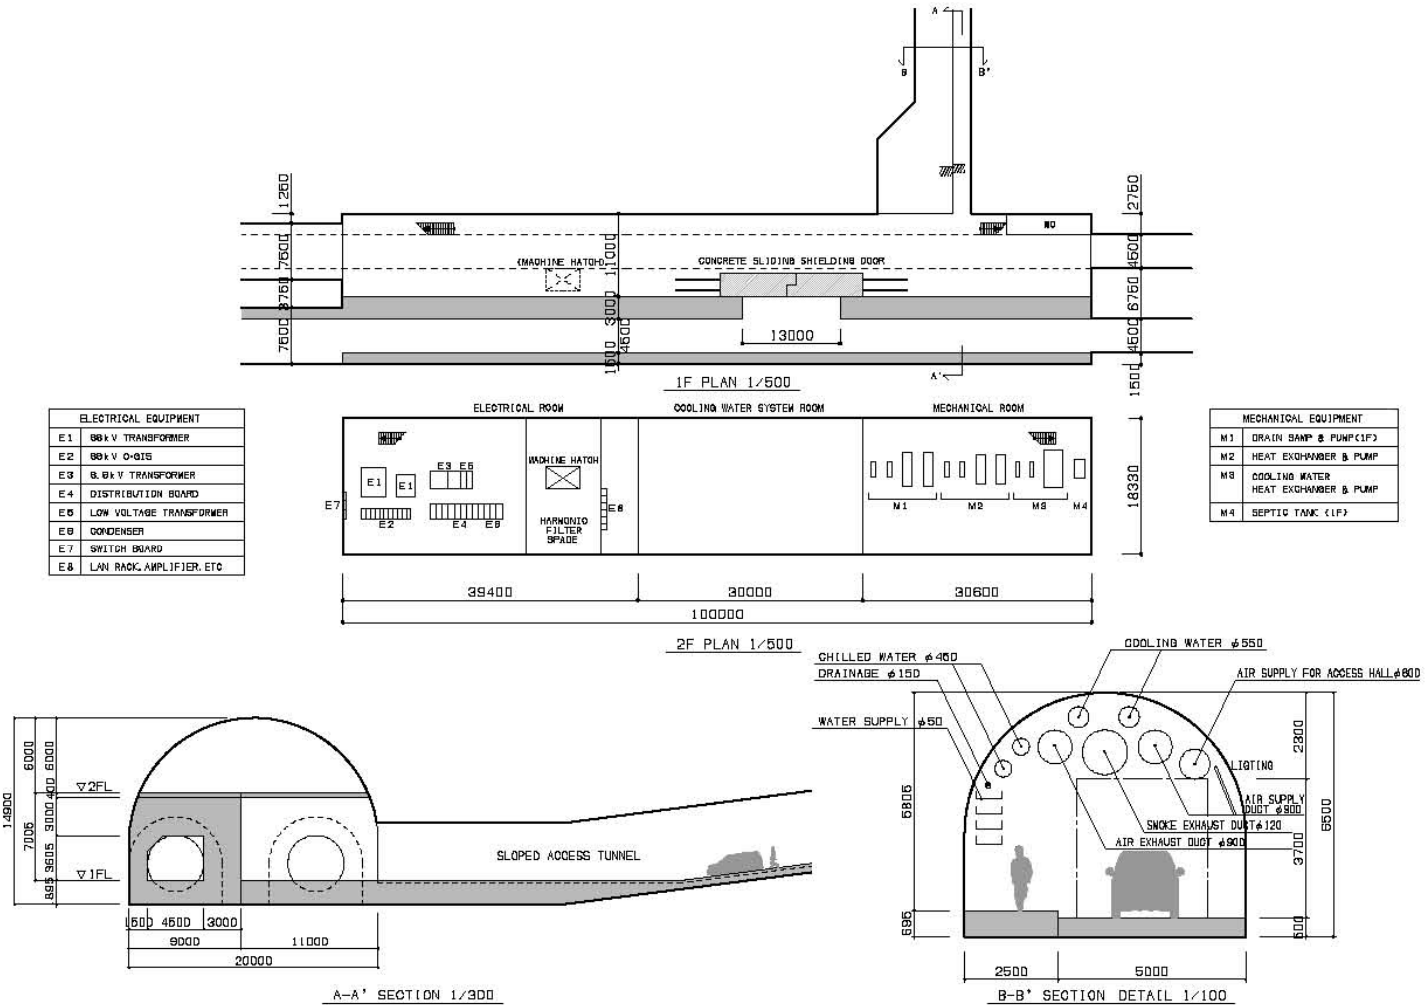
Detail of an access ramp for the Asian Sample Site.
